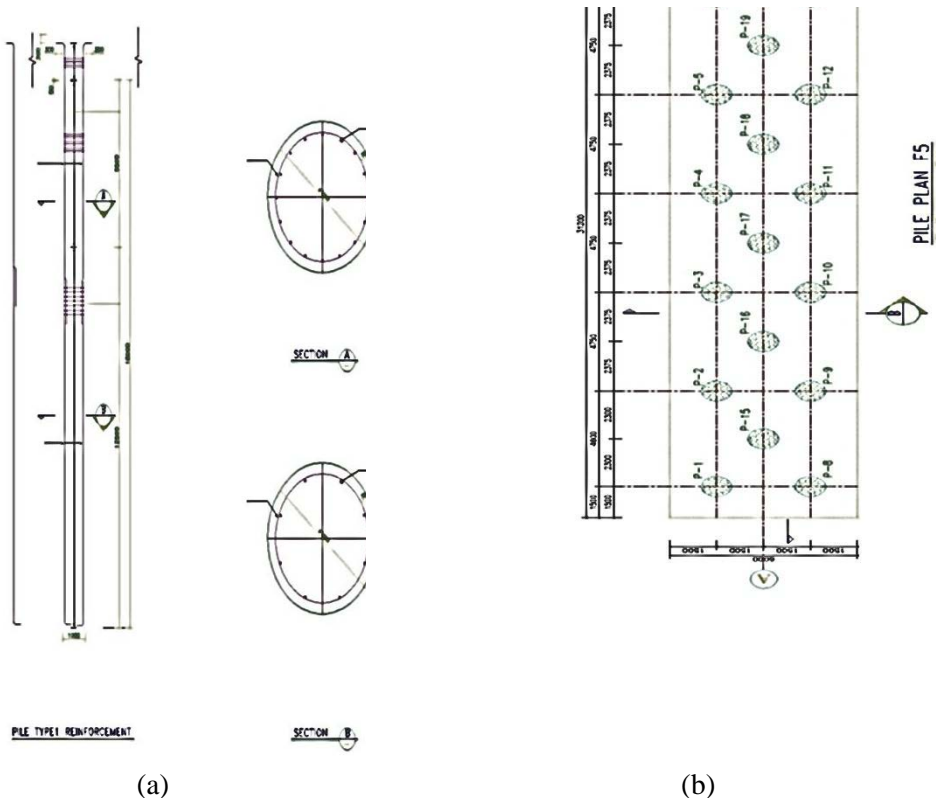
Pile Foundation Description, (a) Pile section, (b) group configuration
